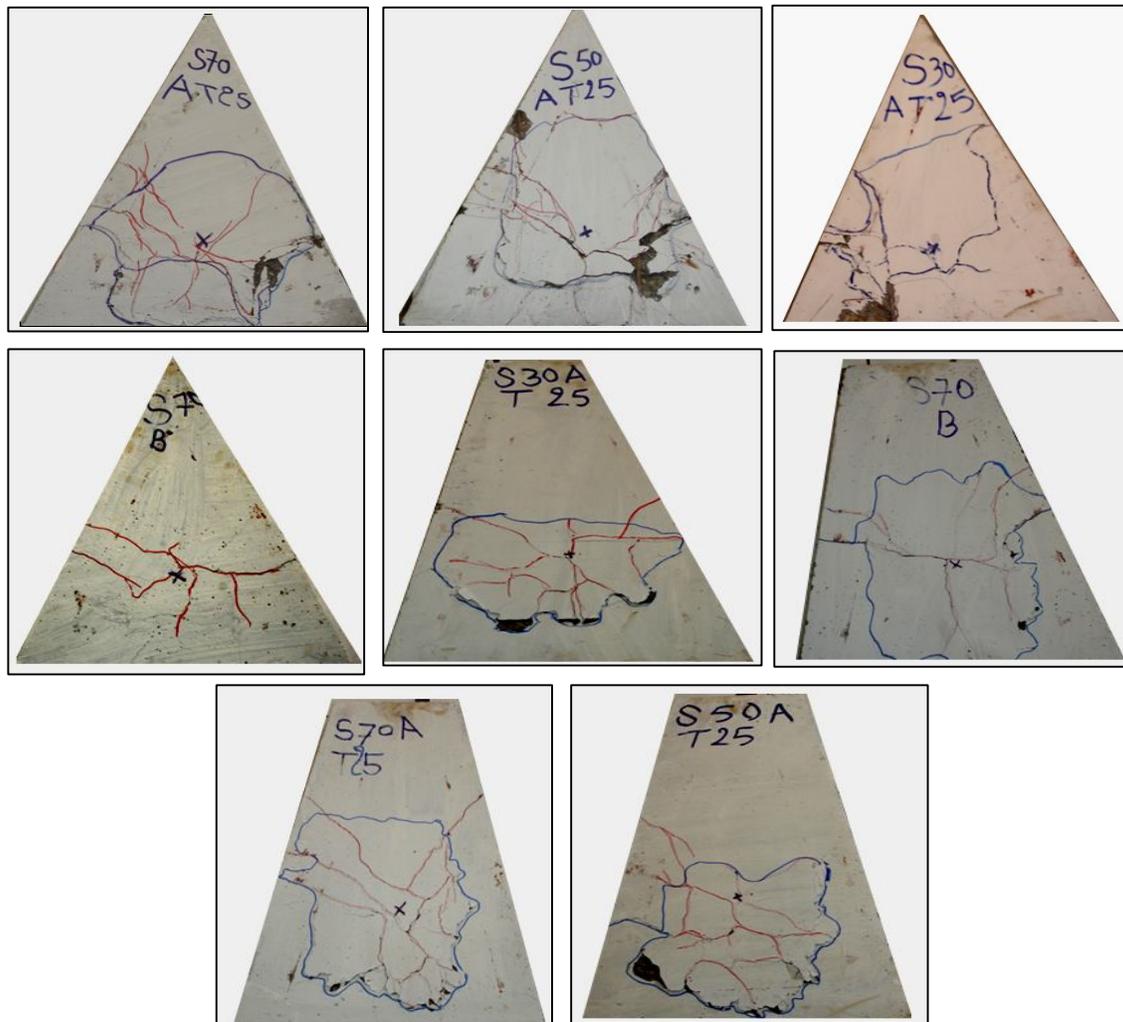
Crack Pattern of Specimens at Failure; Punching Shear and F.
